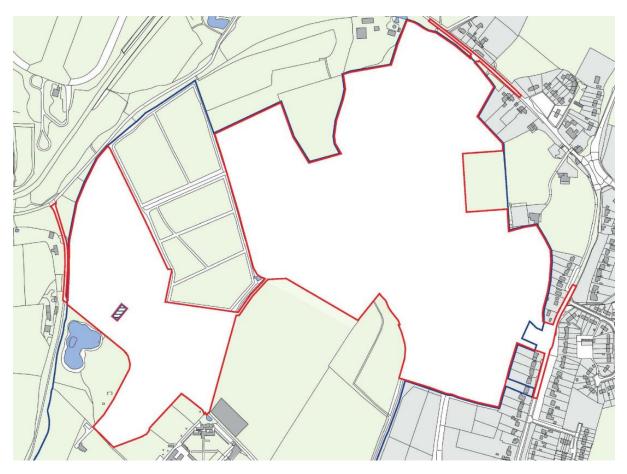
Location Plan extract (Application ref: WA/2015/1381)
